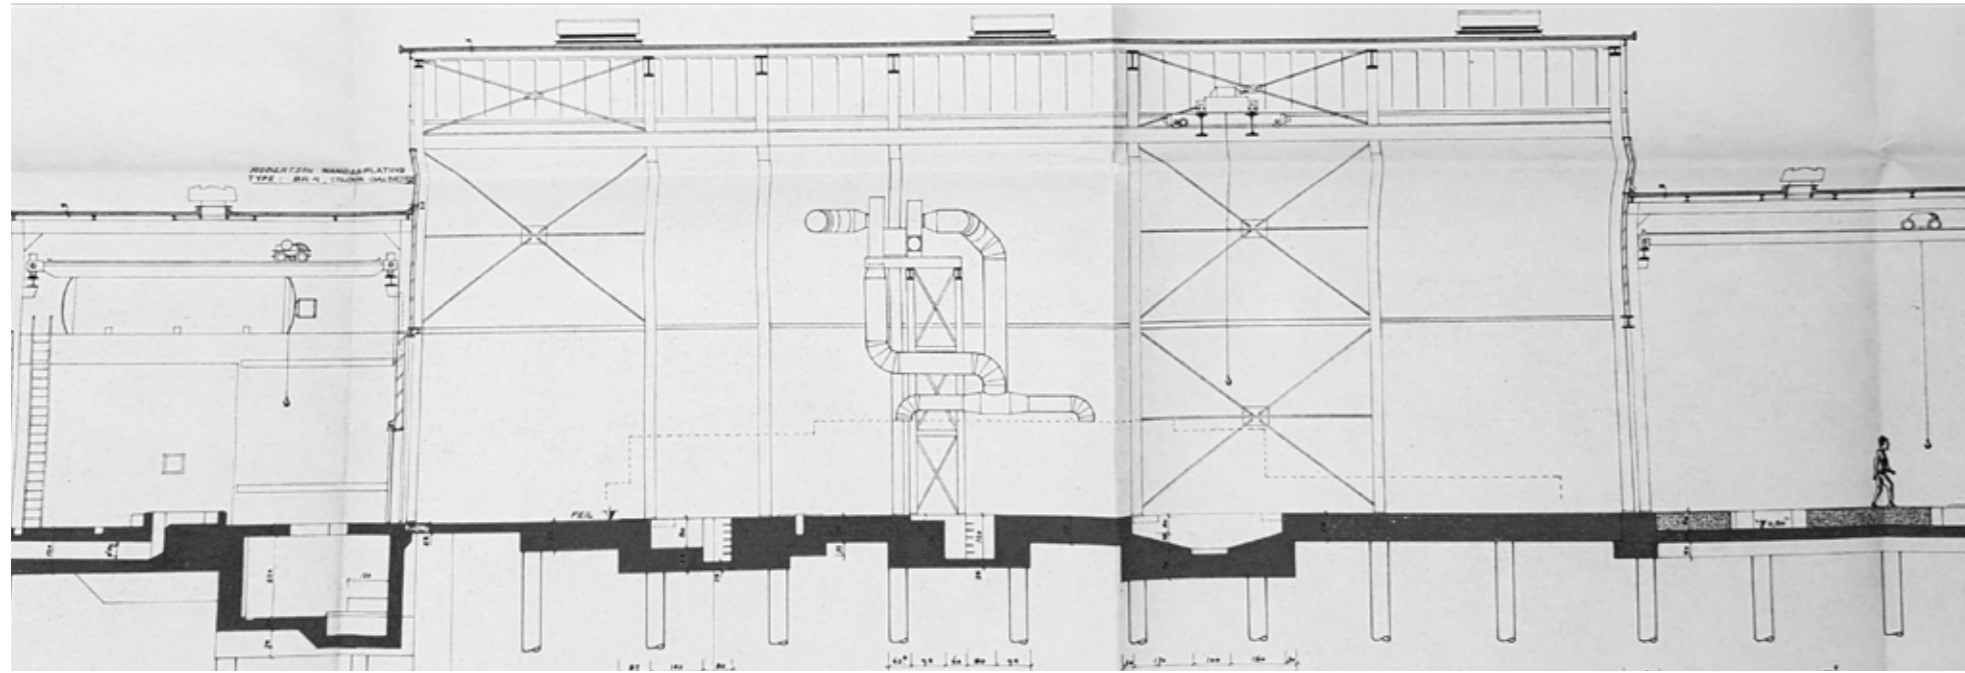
sections J-J and K-K building 436, here the largest press of Europe was located. (Archive Zaanstad)
